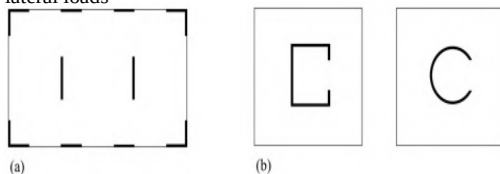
(a) Shear trusses / shear walls in plan, (b) partially closed cores in plan
